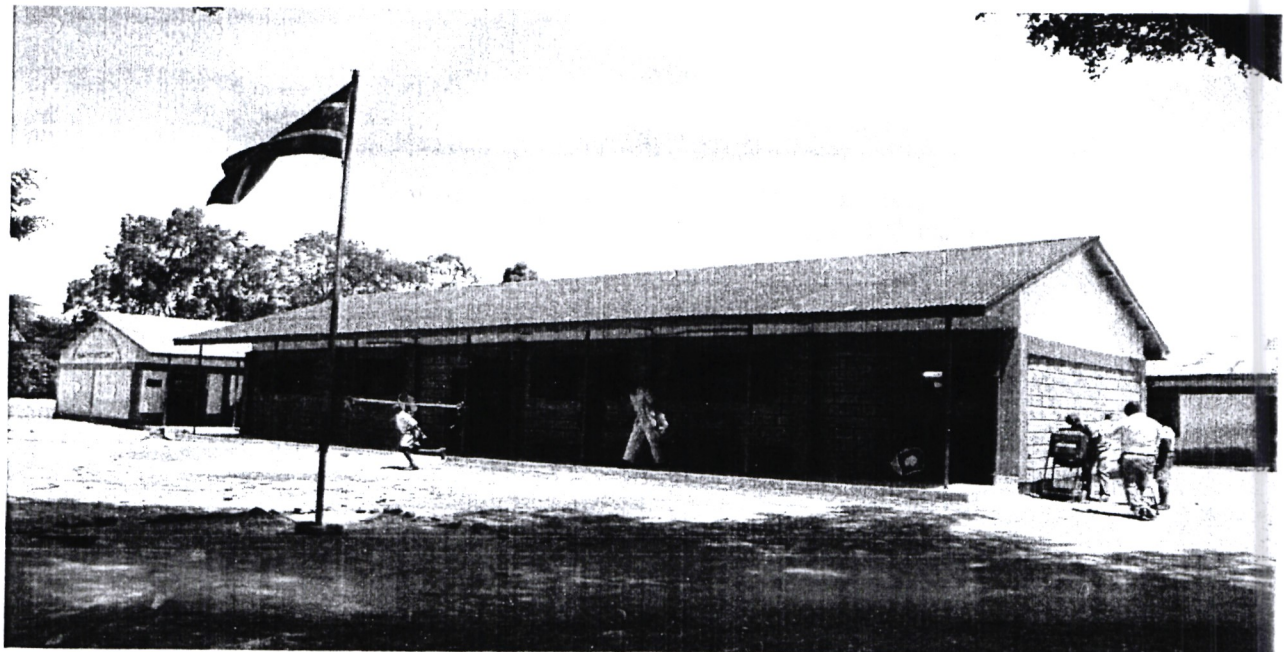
Construction of 2 no classrooms at Tido primary school.
